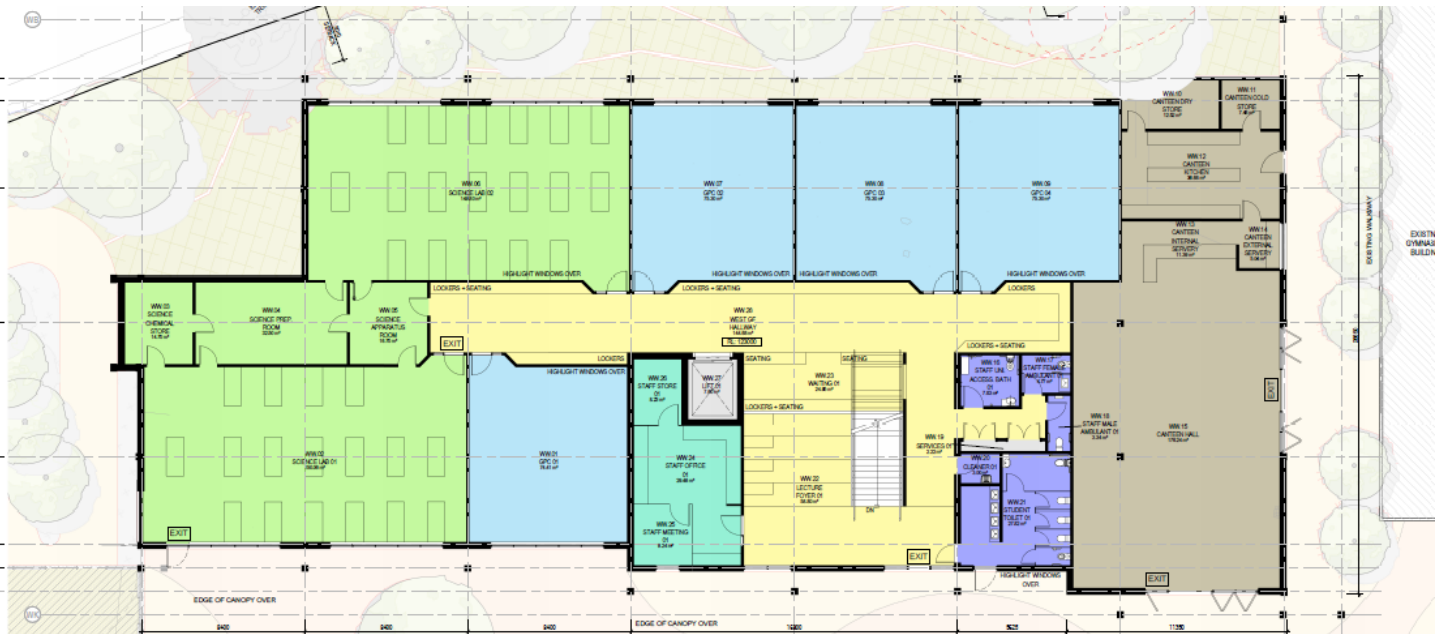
Extract of the ground floor plan of the proposed West Wing building
